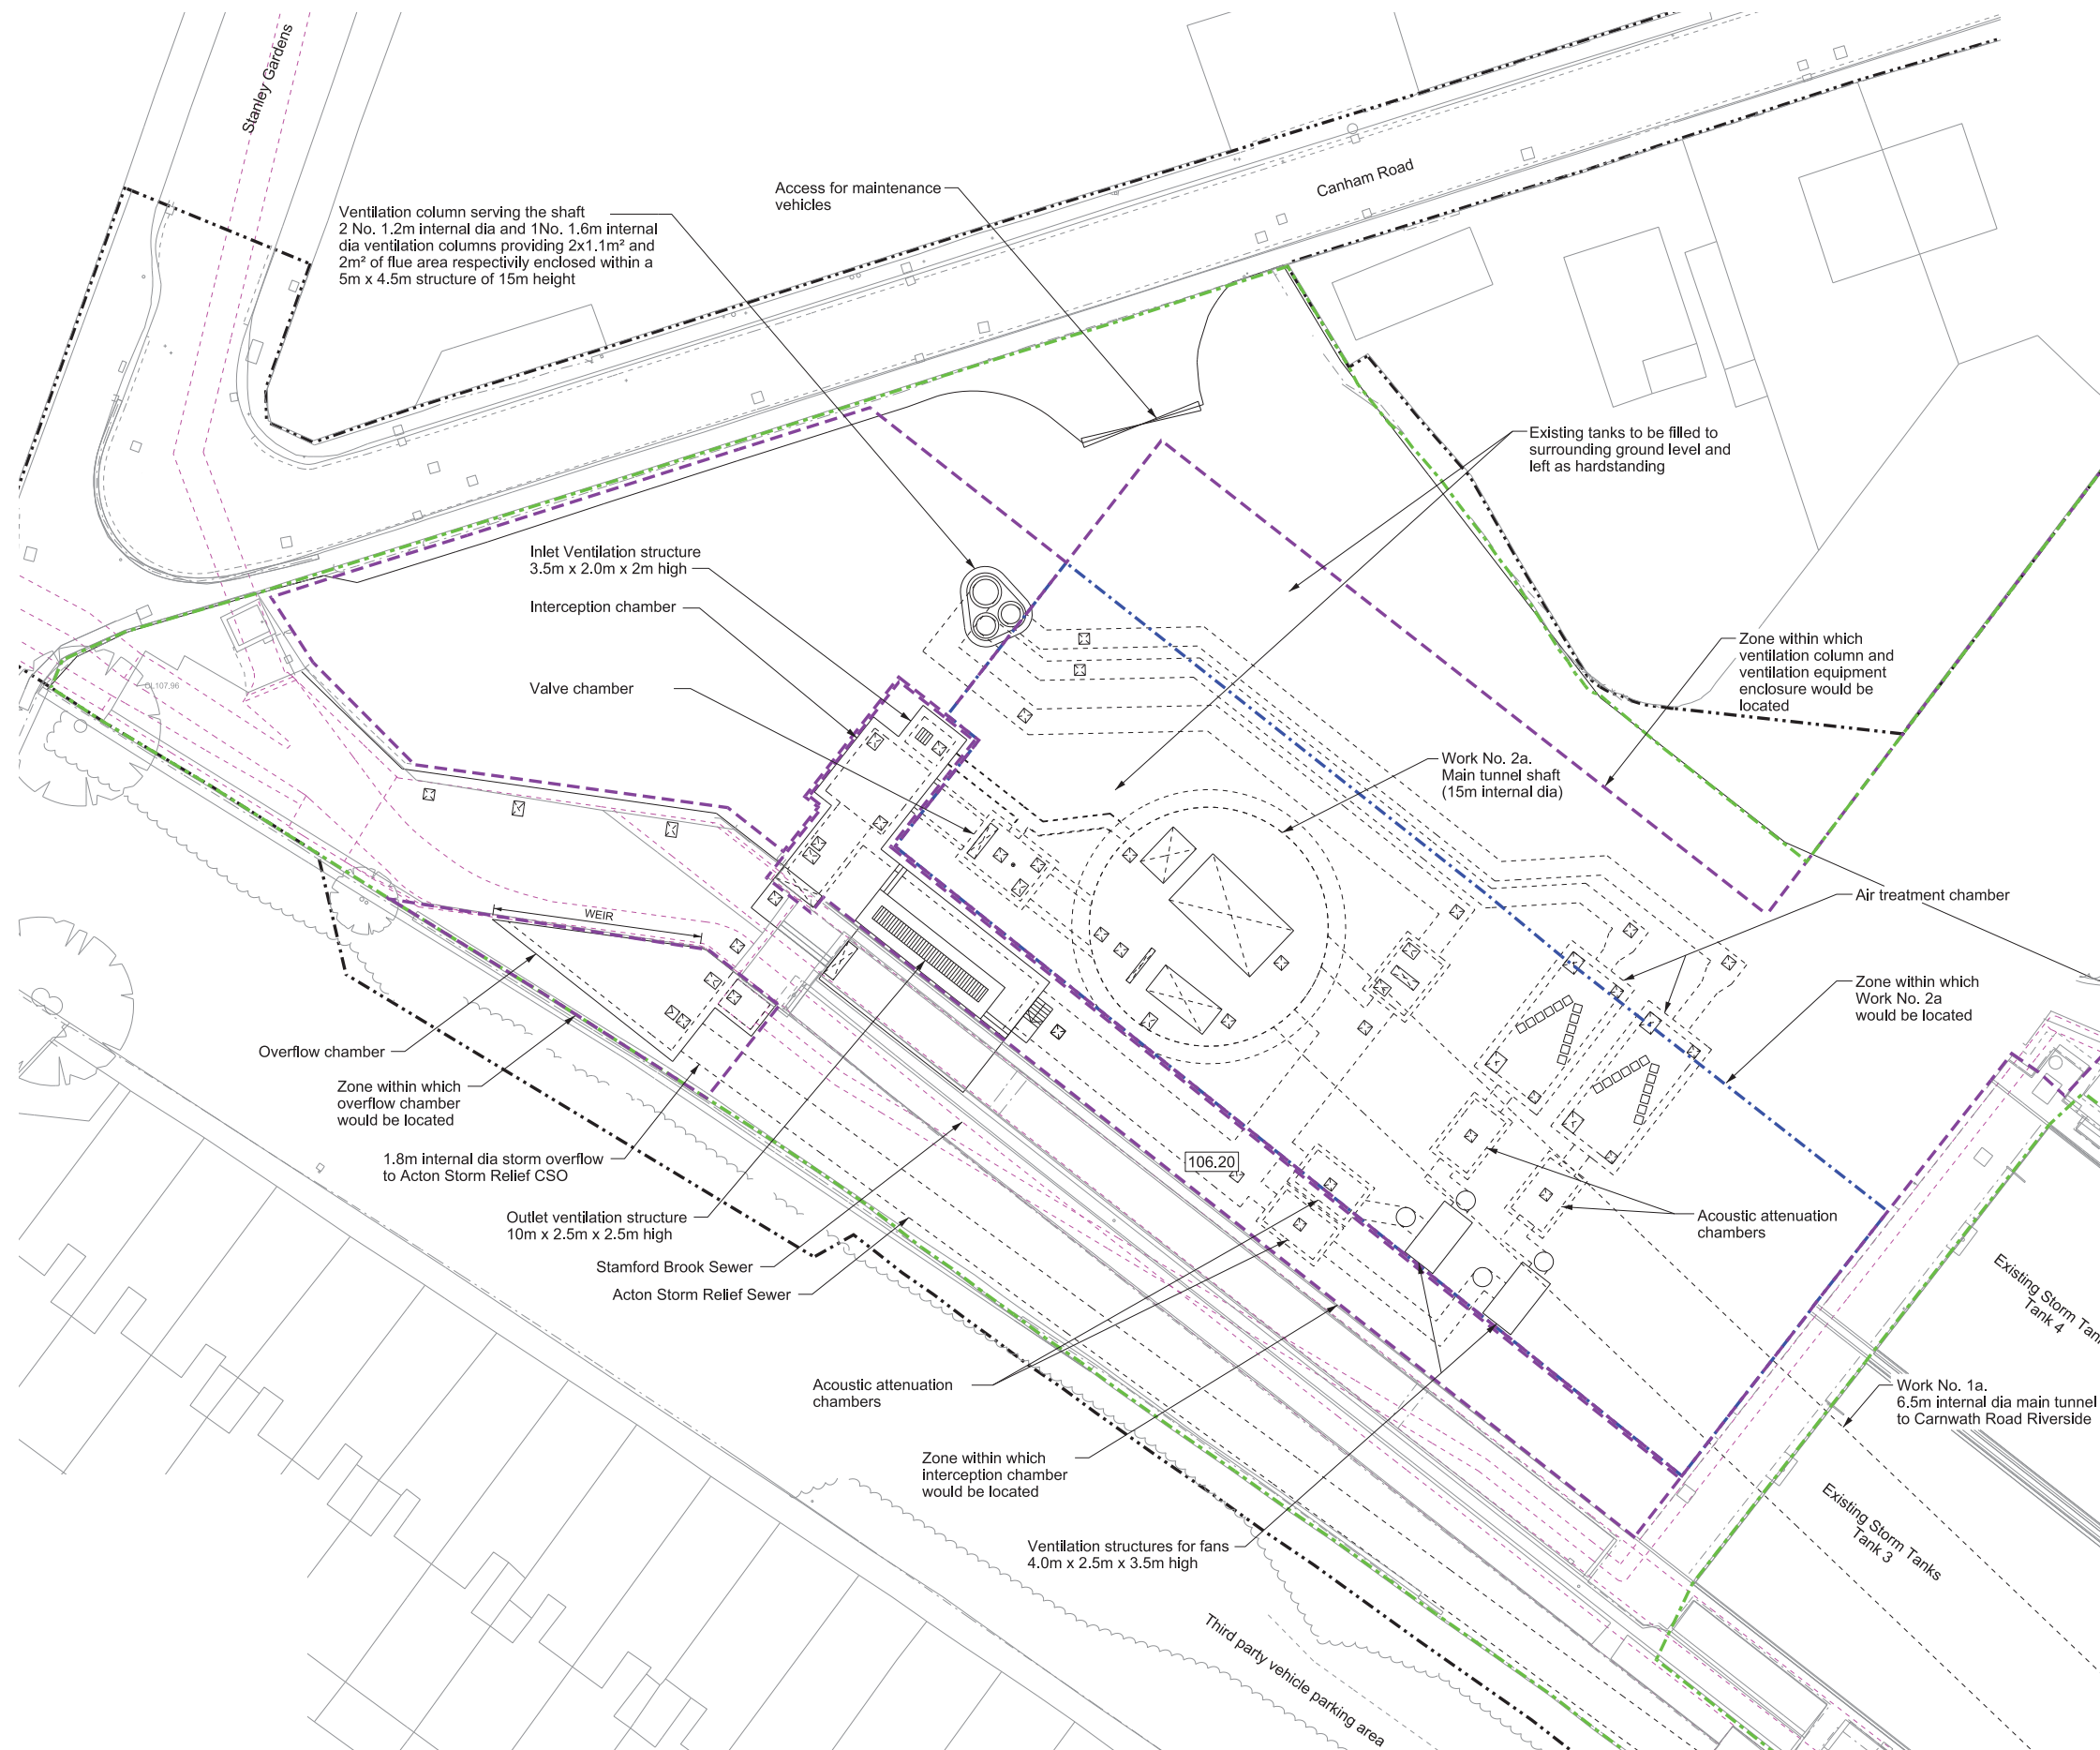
Permanent works layout - refer to Permanent works layout sheet 1 of 2 in the *Book of Plans
